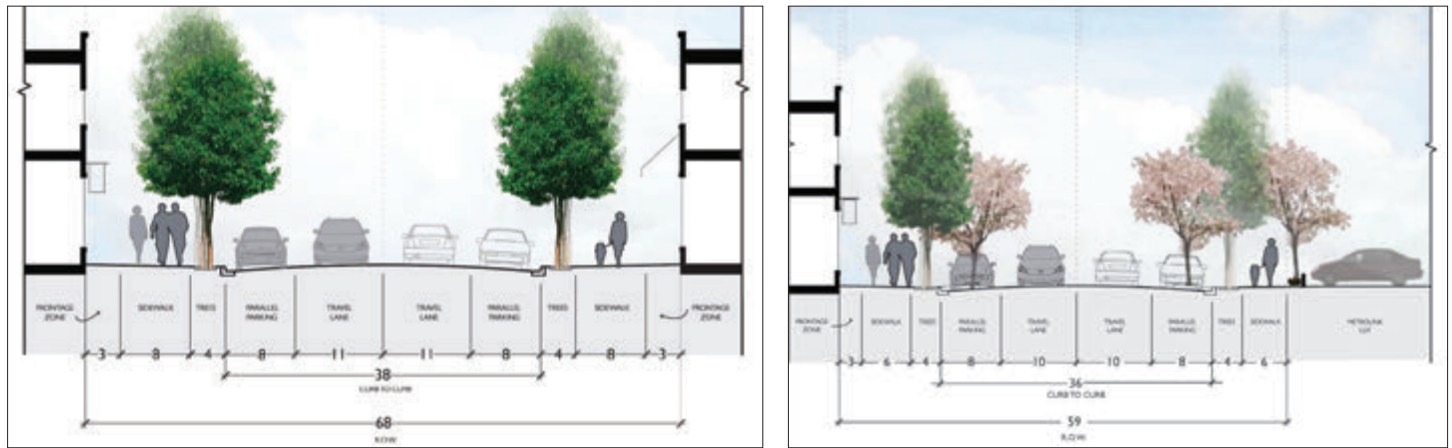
PROPOSED TYPICAL CROSS SECTIONS
